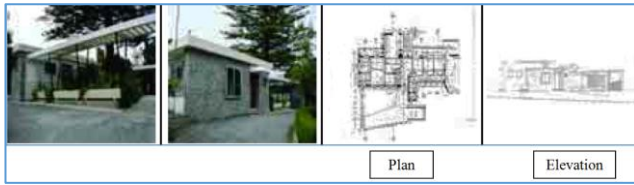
Somek house exposed stone facades, Plan and Façade. (Celik, 2005)
